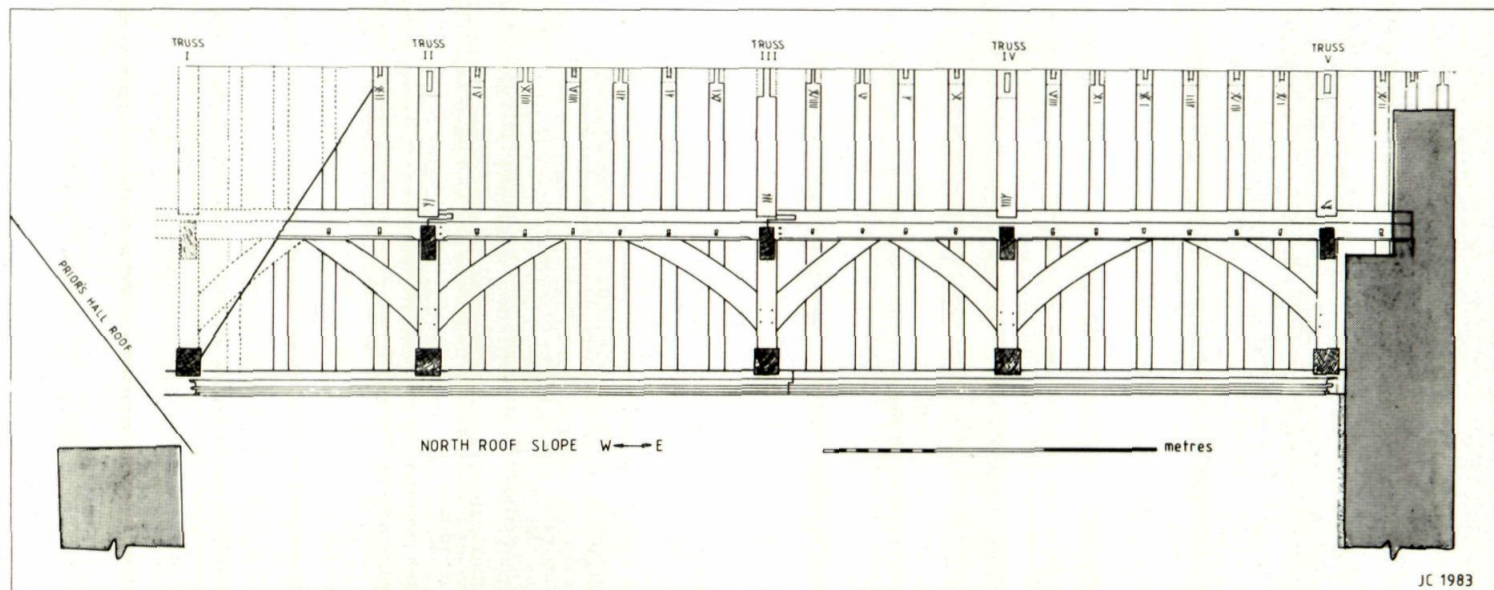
Porch roof. Longitudinal elevation of north roof slope.
